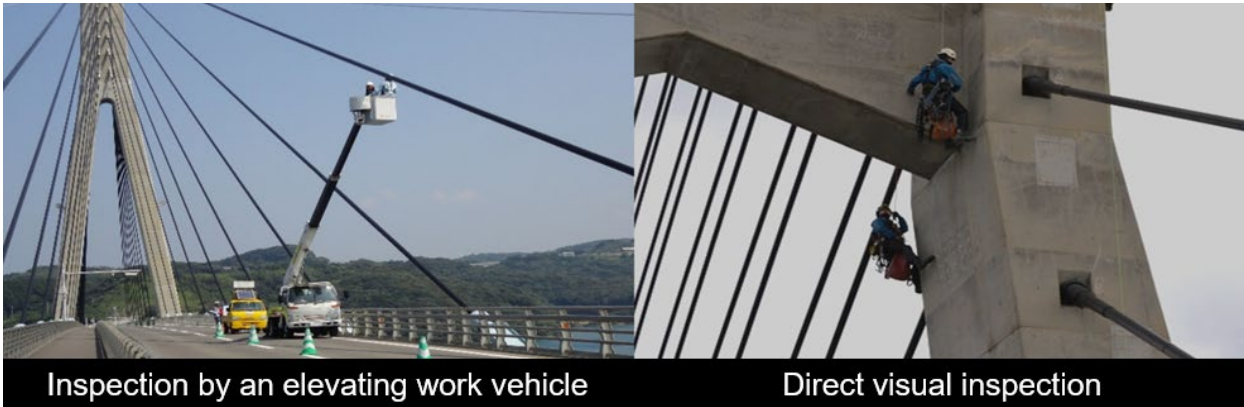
Conventional inspection of cable-stayed bridge cables
